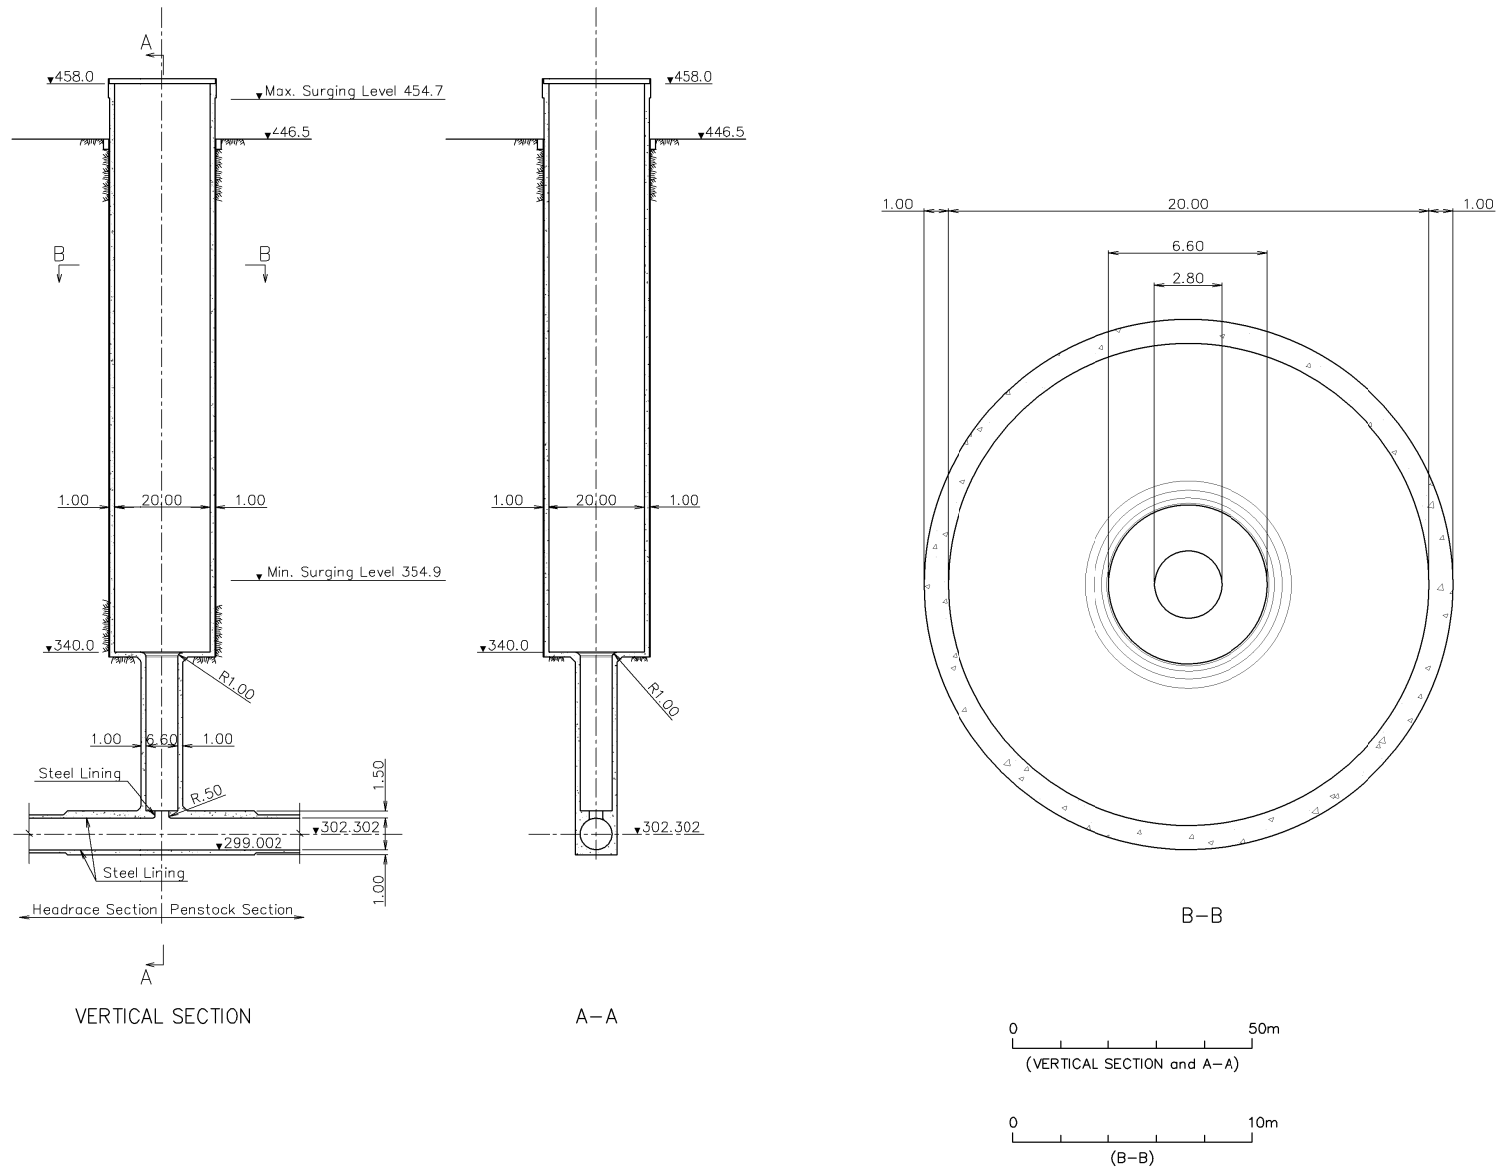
Surge Tank Vertical and Cross Section
